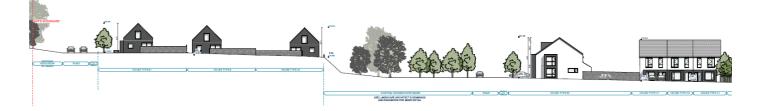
Part cross section through Neighbourhood Zone 1 demonstrates how the building height strategy is designed to work with the natural contours of the site.
